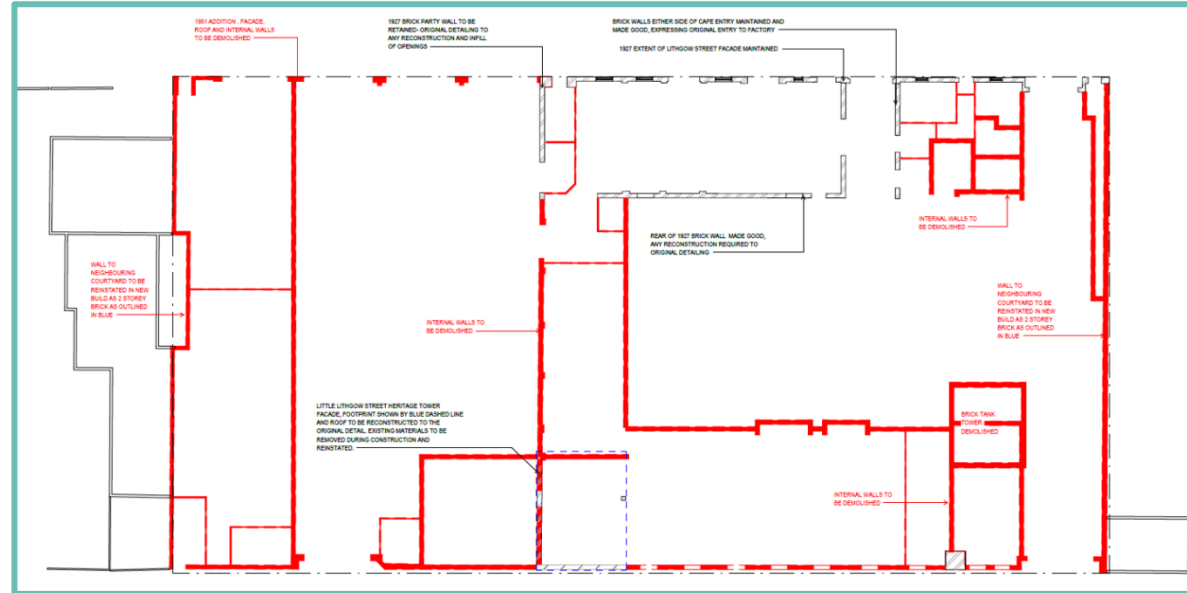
Site demolition plan (ground floor). Source: Warren and Mahoney.
